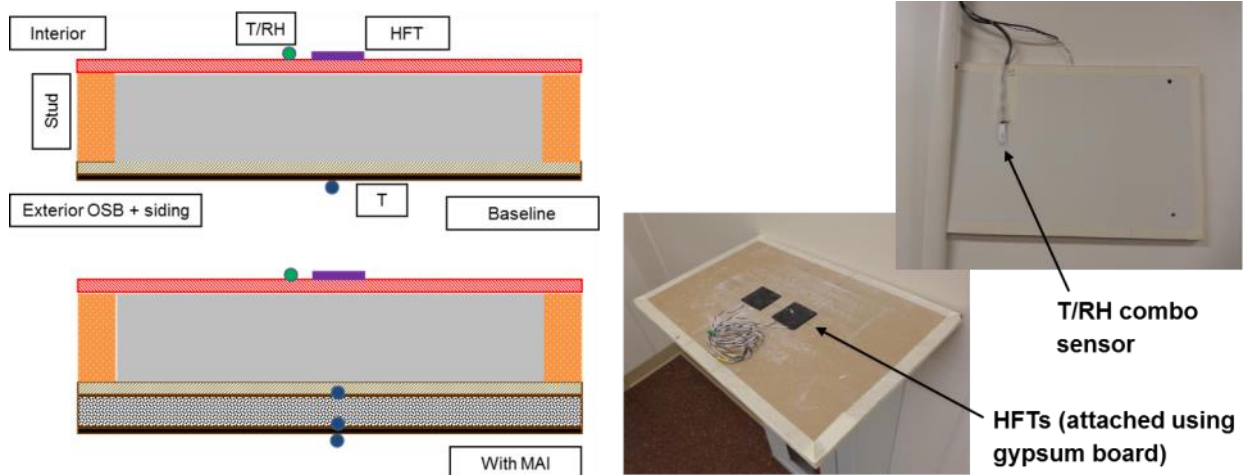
Suite of sensor attached to the walls of the test and baseline building walls
